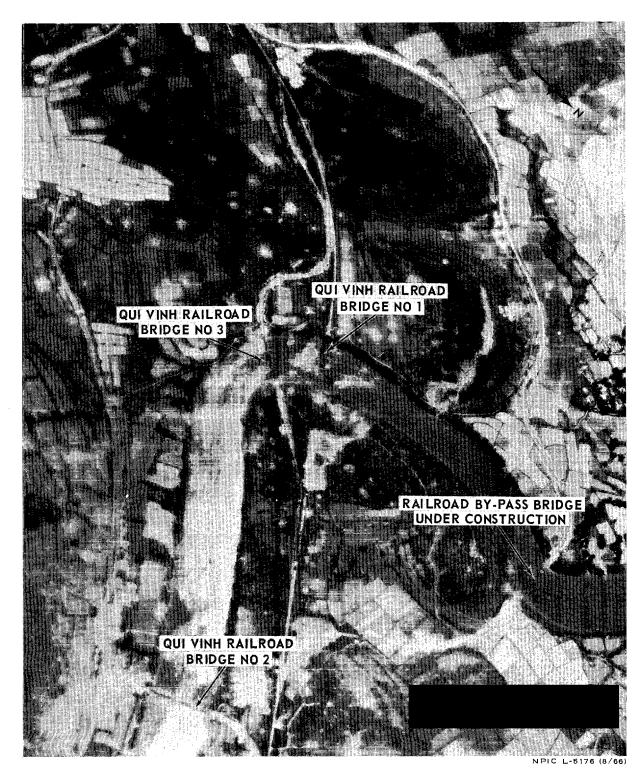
RAILROAD BY-PASS UNDER CONSTRUCTION, THANH HOA/VINH RAIL LINE, NORTH VIETNAM
